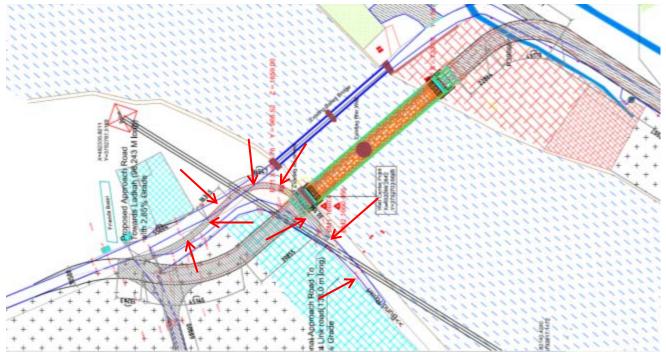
Schematic layout plan showing (red arrows) the proposed "Safe Access Route" for the Stone Crusher Unit, Hallow Concrete Brick Unit etc.
